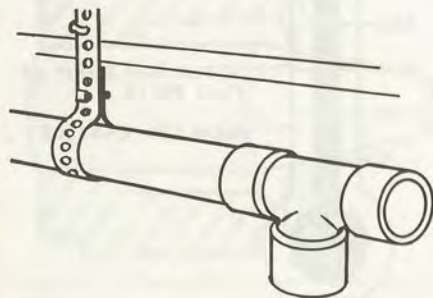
Make temporary supports out of strap steel, wire, or any similar material that will do the job.
